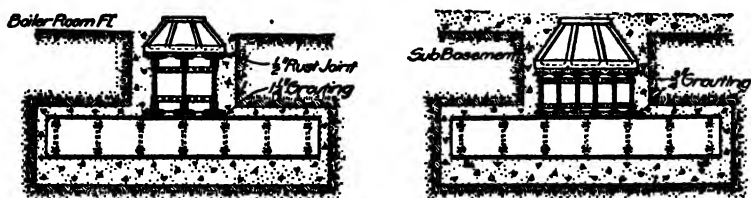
Footings with Plate Girders and I-Beams in Double Tiers.
